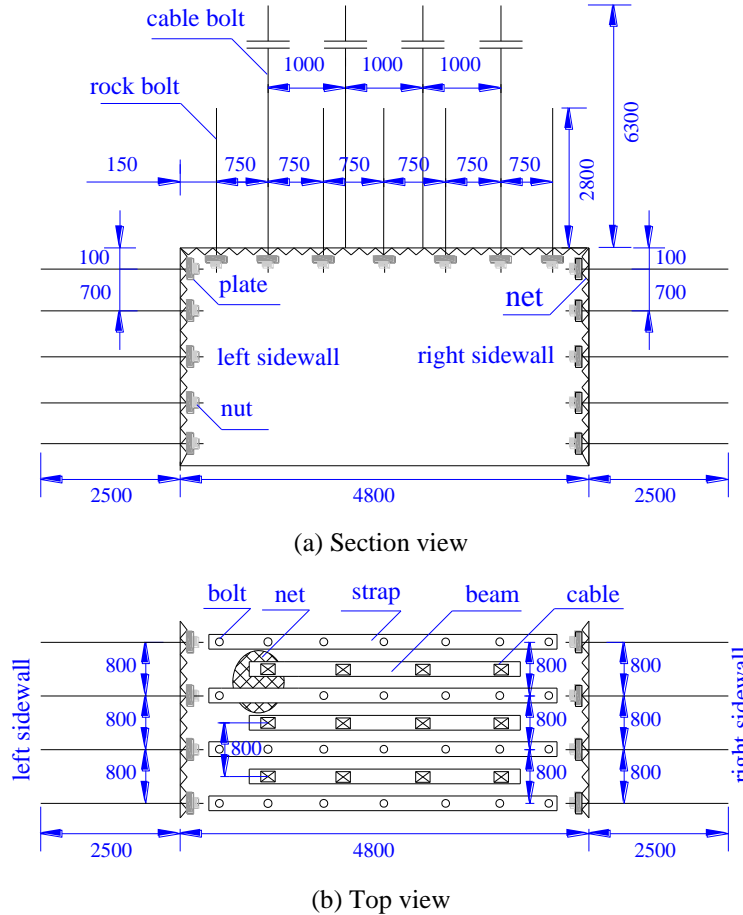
First roadway supporting parameters during roadway excavation (mm)
